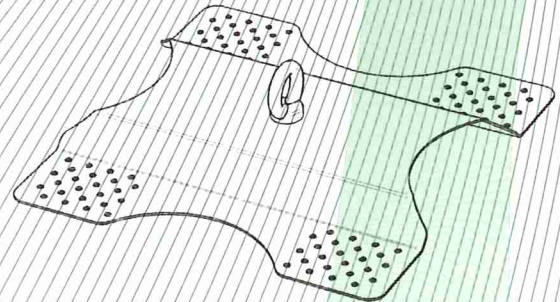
Anchor device, type: STEELFIX EVO Roof Anchor with eyelet
